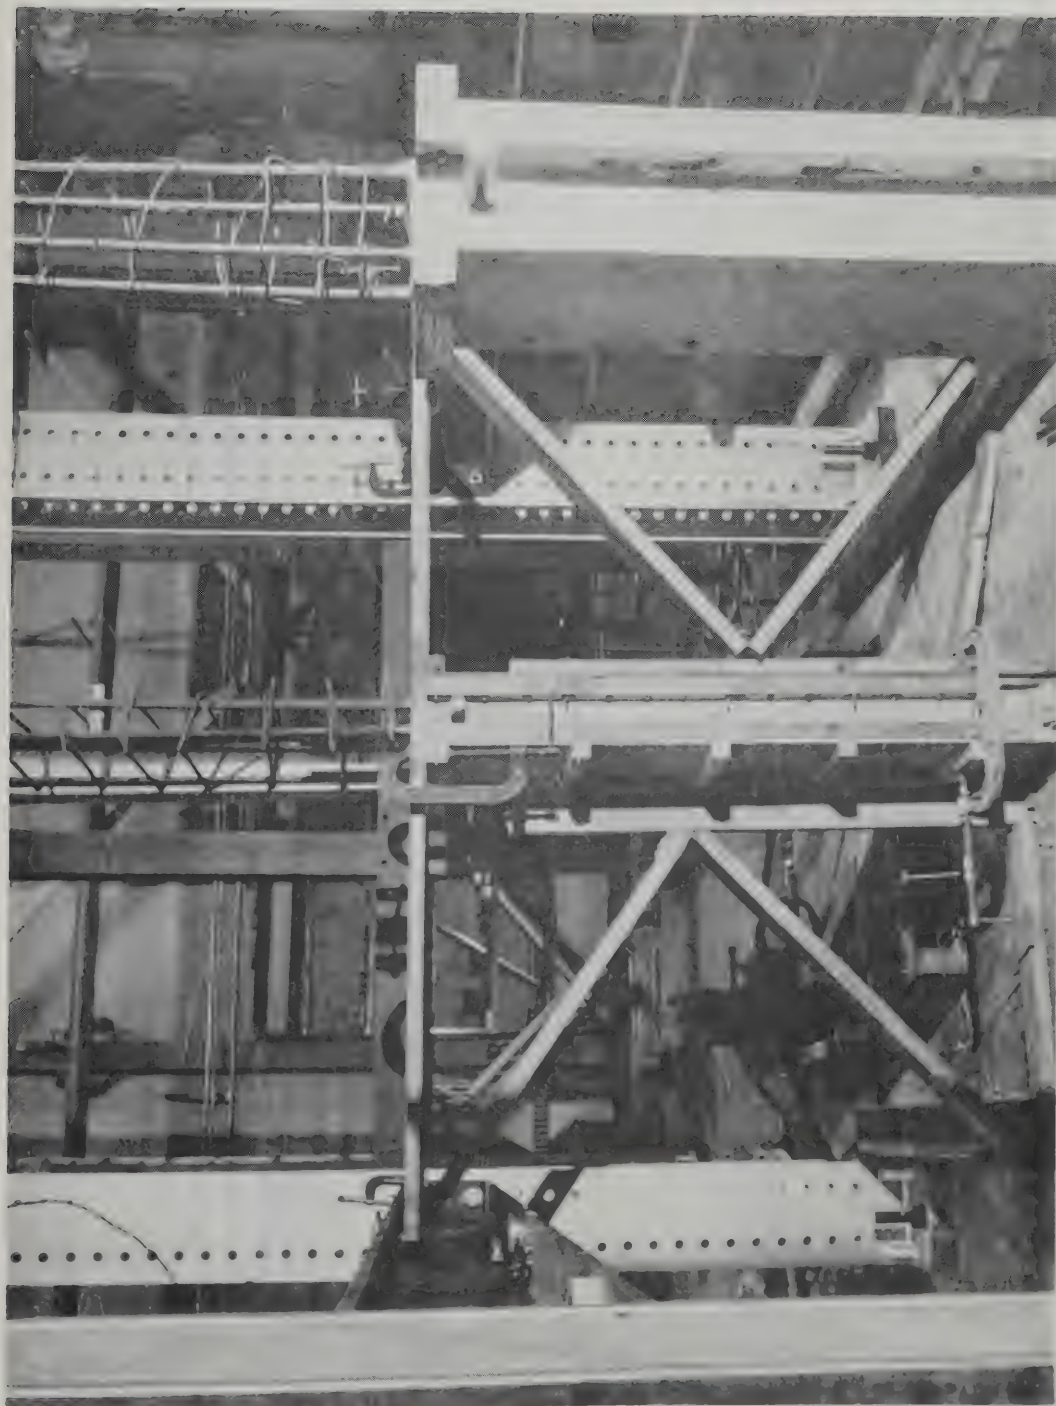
SPECIMEN UNDER CONSTRUCTION
